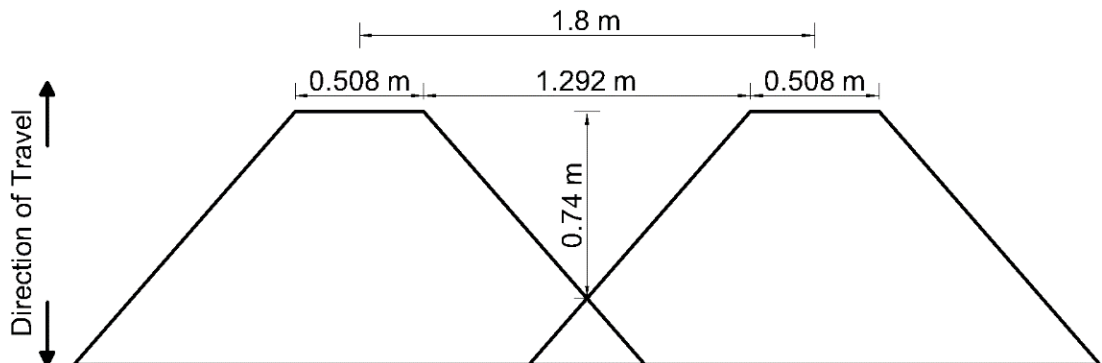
Wheel spacing and load projection for HS20 truck.
